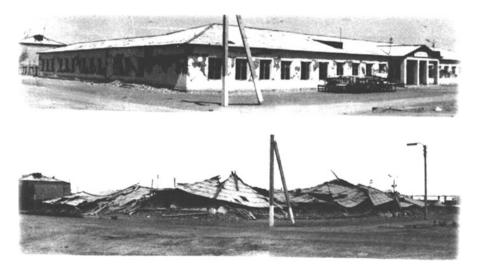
Damage patterns after earthquake impact: destroyed school building made of earth block masonry (Gazli, Uzbekistan, 1976) [45]
